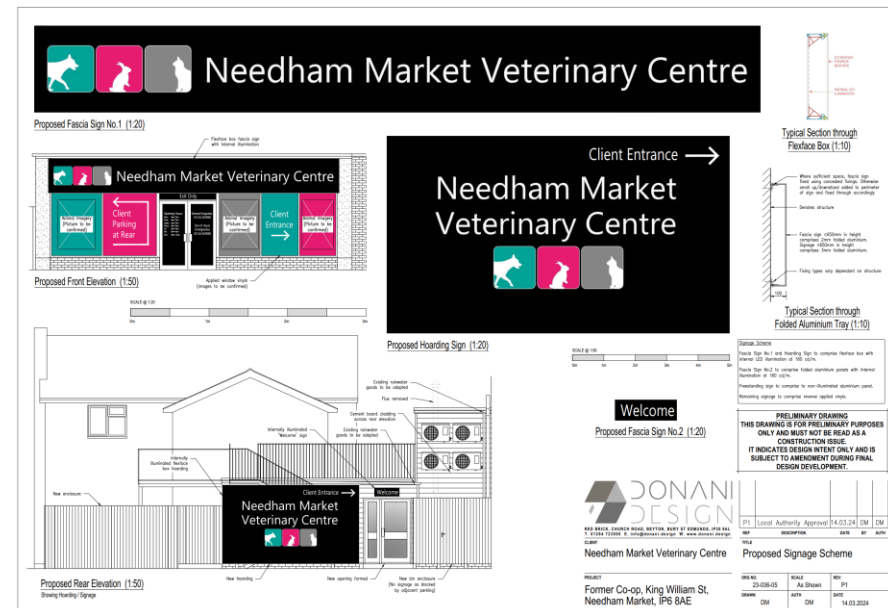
Extract from Signage Scheme drawing (Source: Gov.uk)
